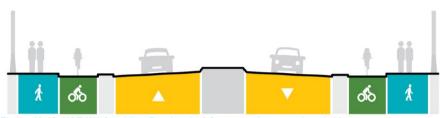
NOR W4 Spedding Road typical Cross section – two lane bridge
